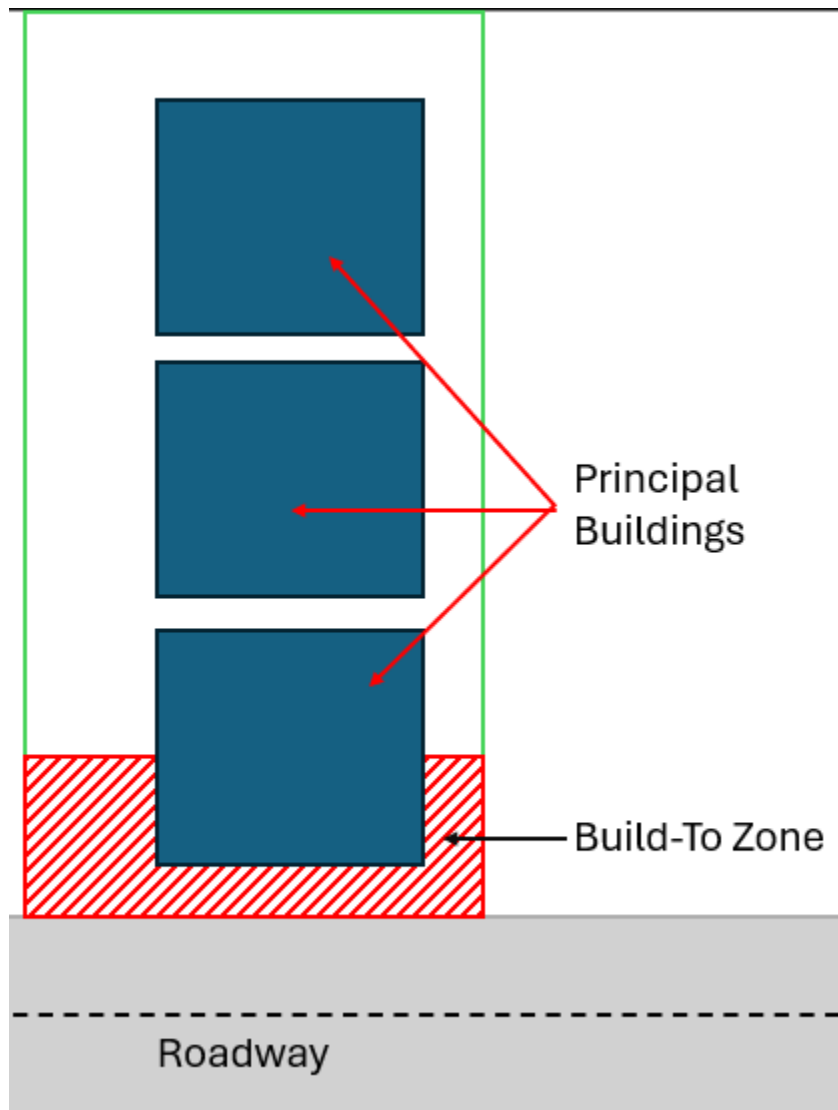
Illustration depicting additional buildings placed behind the first principal building in the Build-To Zone
